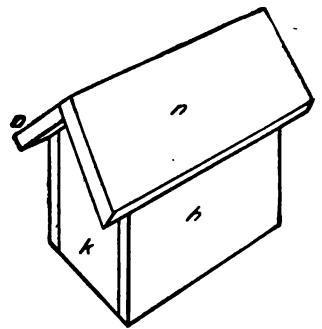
House ready to place over floor and posts as shown in figure 14.
